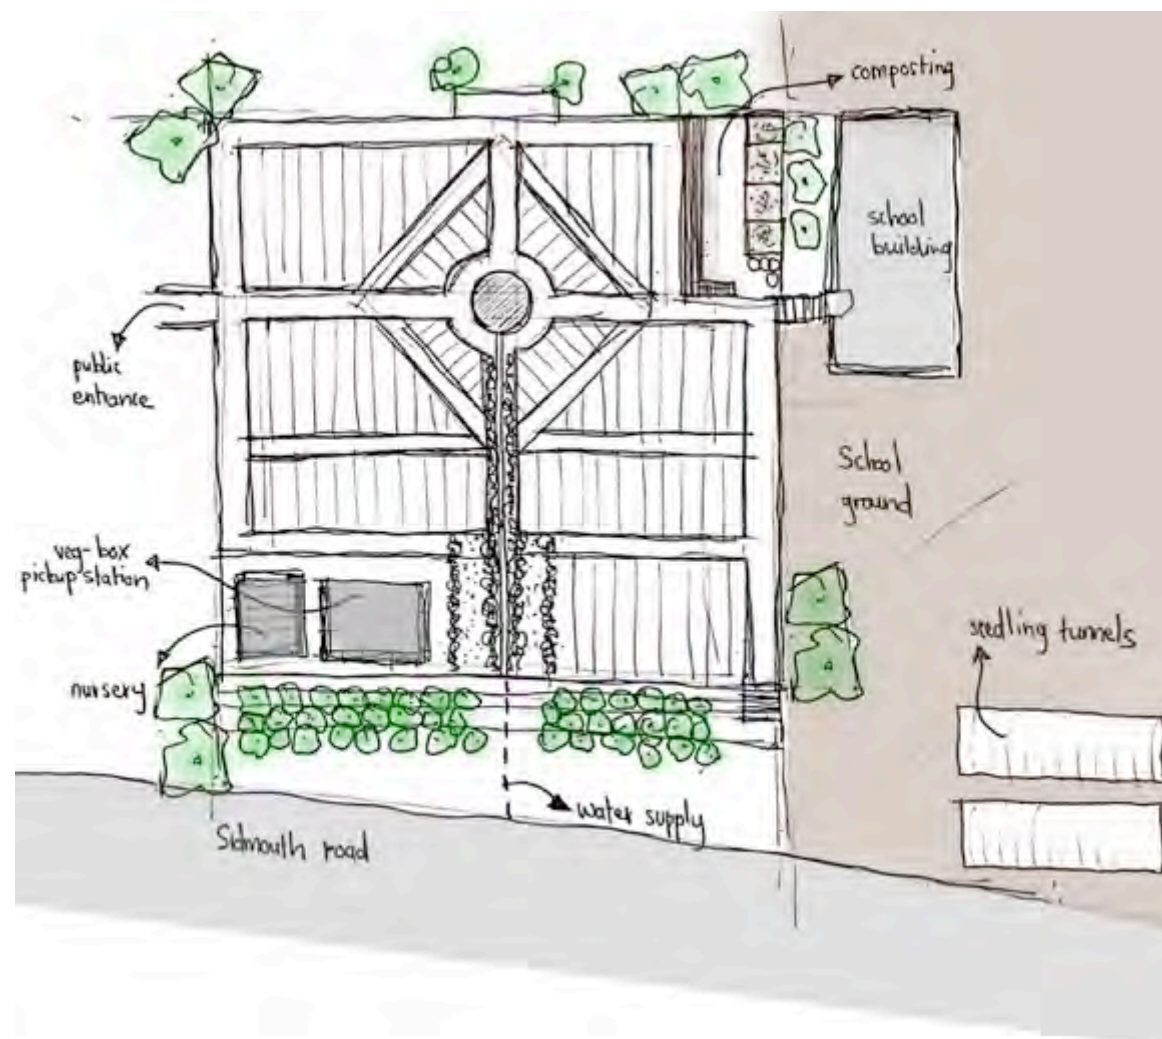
Sketch plan of Oranjezicht City Farm (not to scale)
